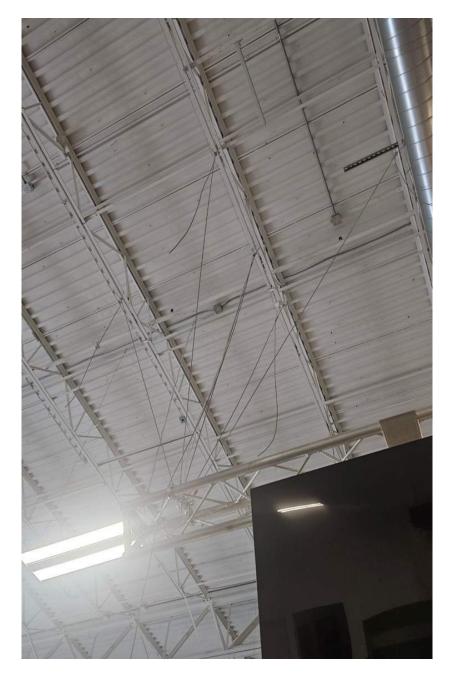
PHOTOS OF TELEVISION TRUSS WITH VT-10-600UD TRUSS PICK POINT
